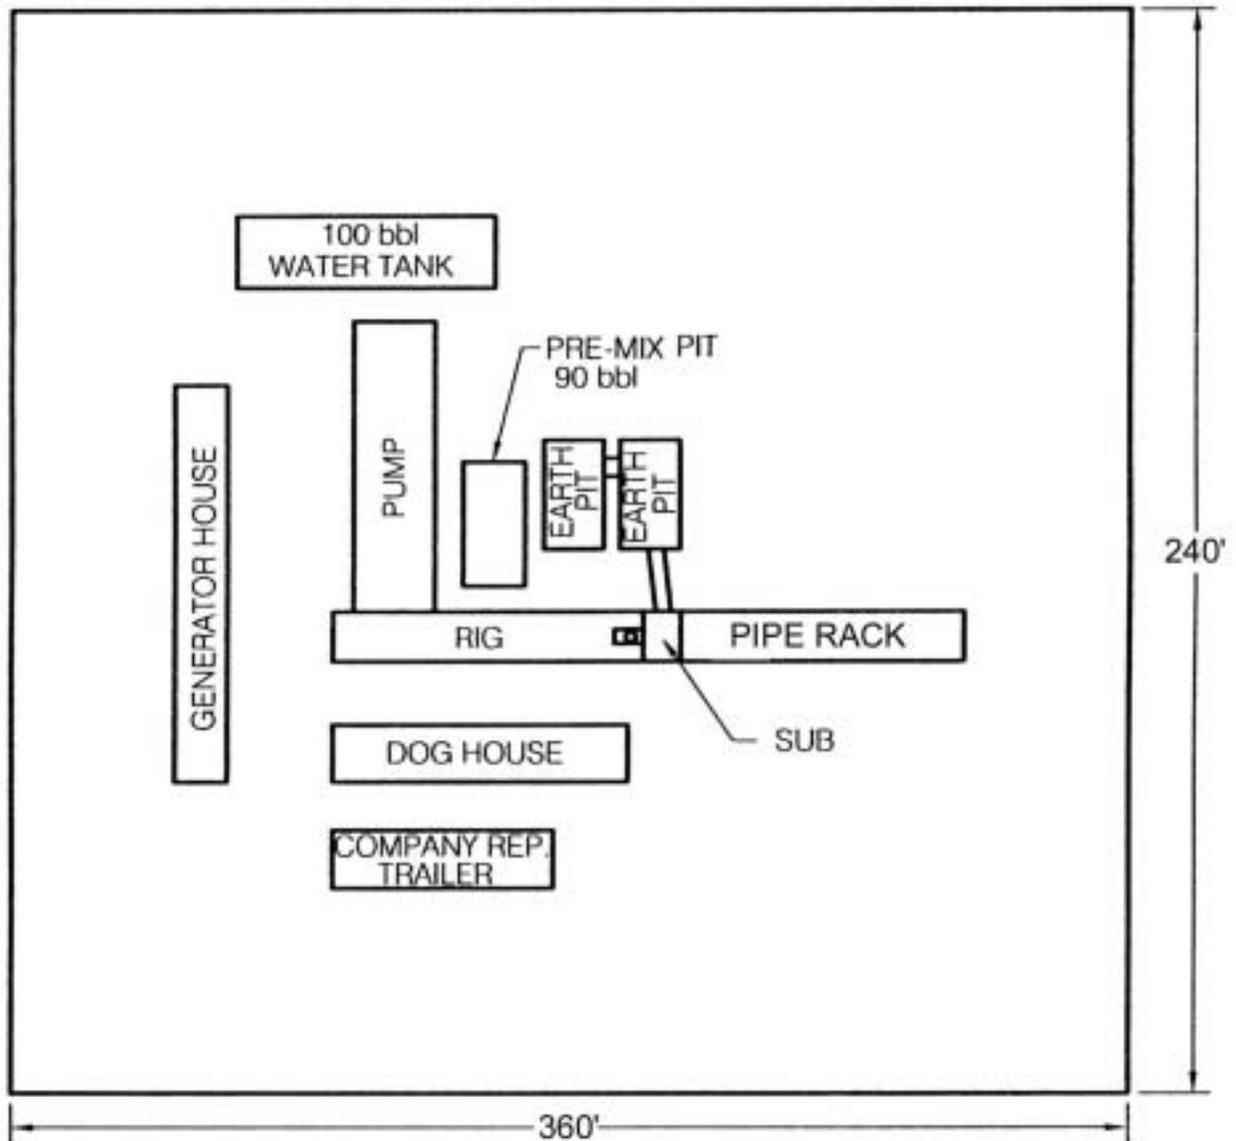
Typical Drill Site Layout – Copper Ridge Shallow Gas Project.
